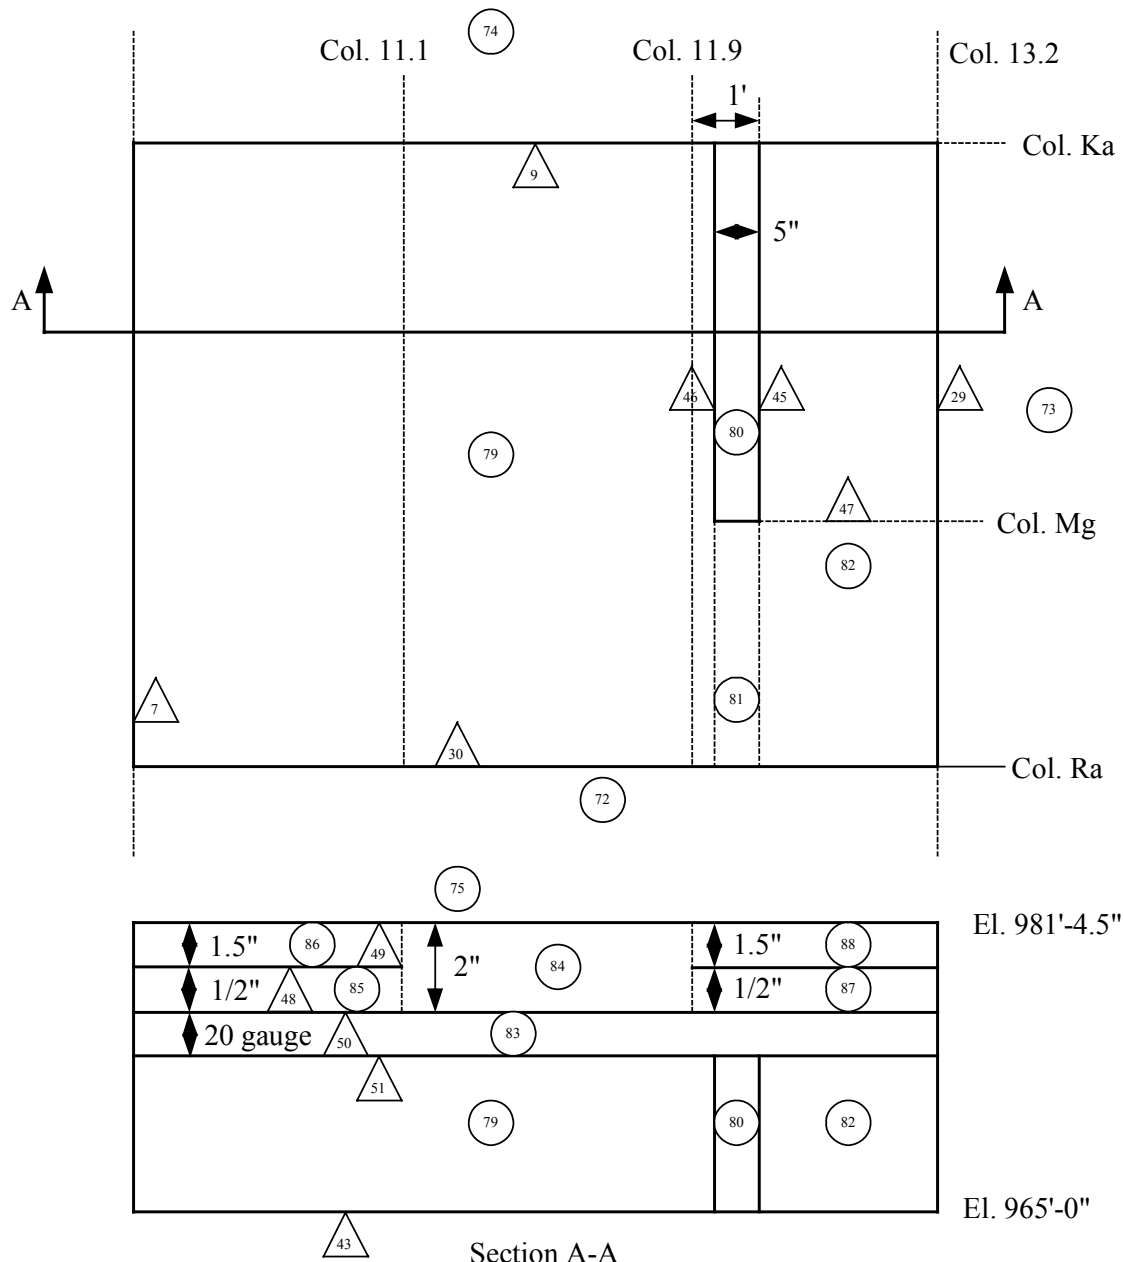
Geometry Model for the Control Building, Elevation 965'-0" (Not to Scale)
